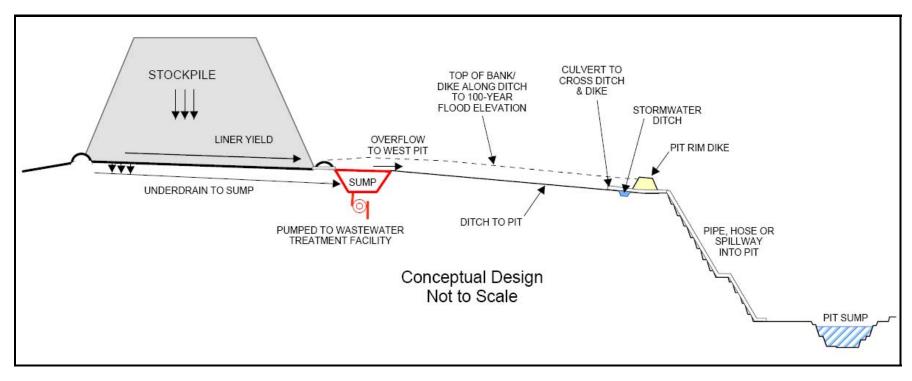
AConceptual Category 1/2 Sump Layout
